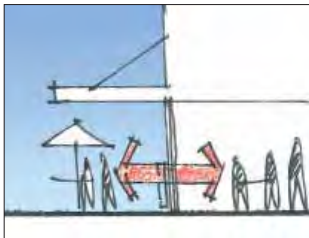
Section AA. Typical cross section through the Riverside public plaza / open space.
